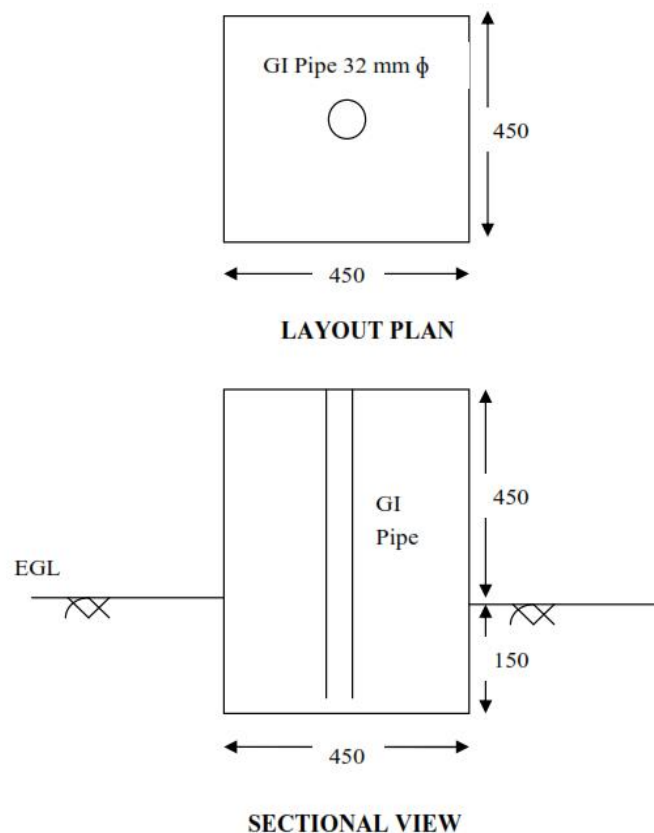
FIG: LAYOUT PLAN AND SECTIONAL VIEW OF PERMANENT BENCHMARK
